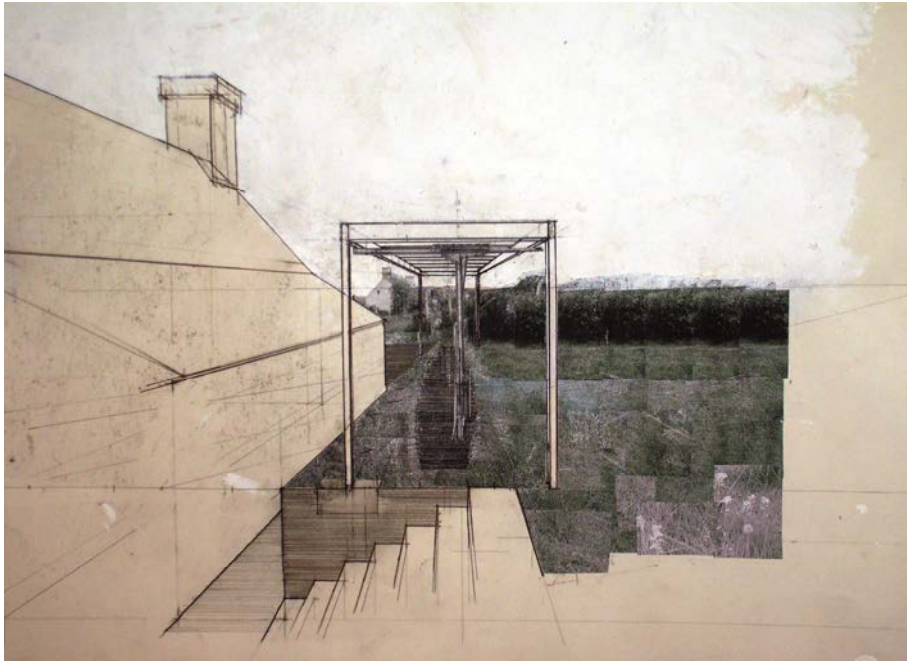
Sectional perspective from top of steps looking towards calendar and allotment. Rosemary's house is to the left.
